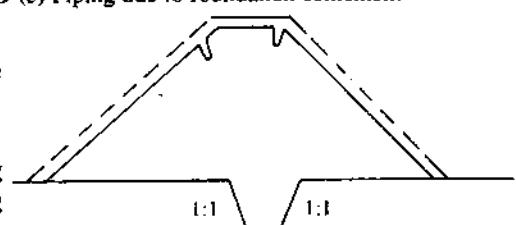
Embankment cracking due to foundation settlement
